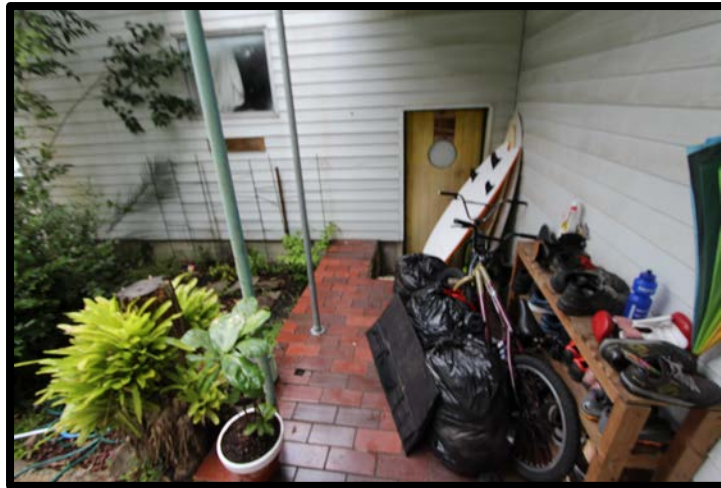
Existing front patio entry. (*Action Plans 2020.*)
